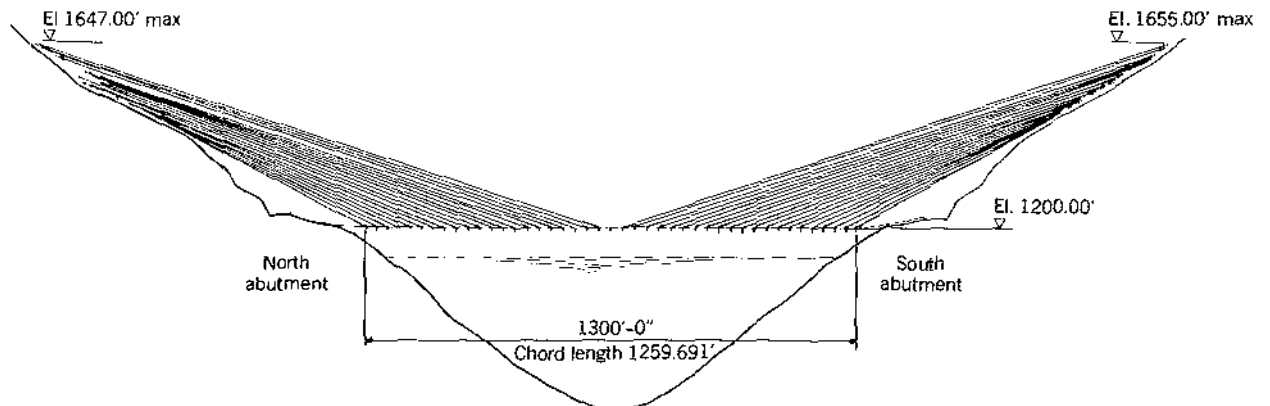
Ruck-A-Chucky Bridge, elevation of bridge with concrete alternate, from reference 24.
